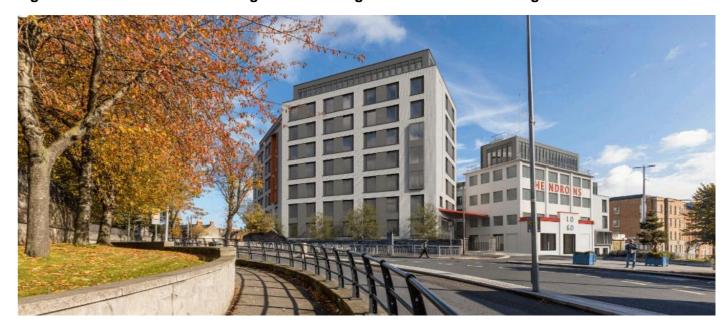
View 18 from the Royal Canal Bank looking towards Western Way with the building outline in red
